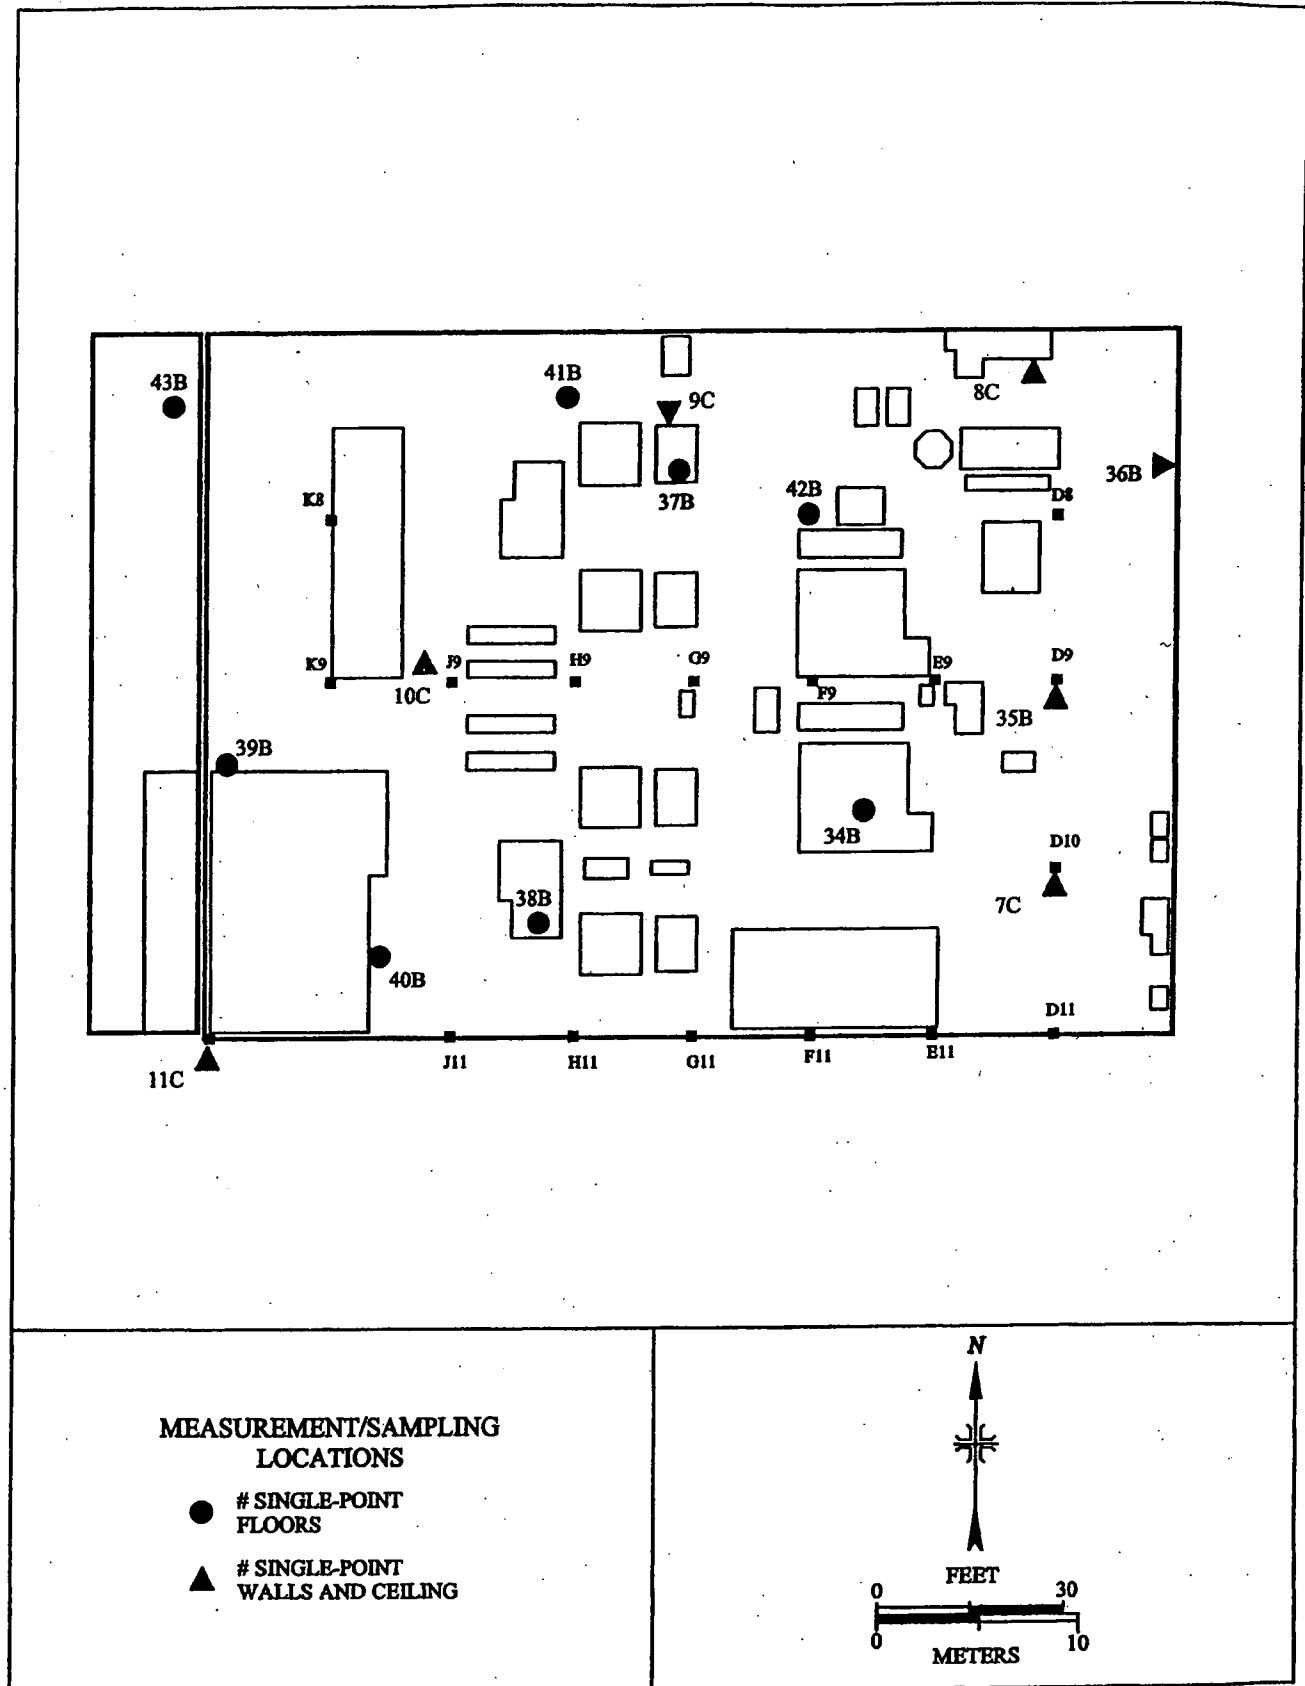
Building 707, Second Floor, Survey Unit 707010 - Measurement and Sampling Locations
